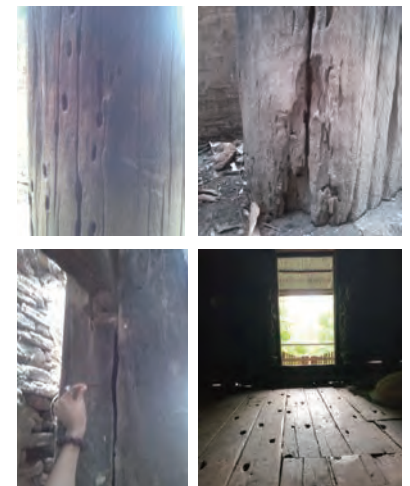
Insect holes on weathered teak columns, Deterioration caused by termites and Extended cracks on the column and holes on floorings inside building
